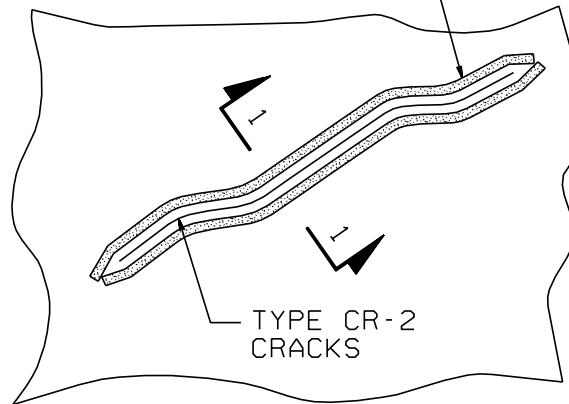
Section 1-1 – Horizontal Surface Crack Repair Detail (for cracks 0.8 mm (1/32”) wide and greater) (FHWA, 2005)
